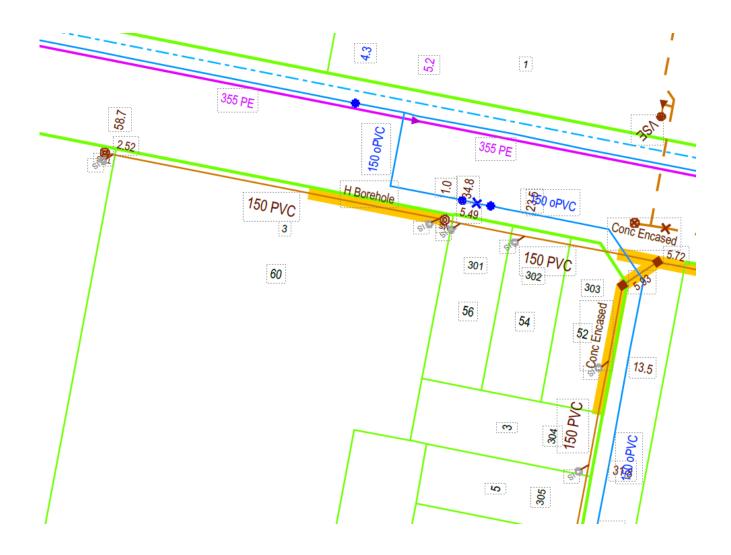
The arrangement of existing Sydney Water, available Sewer, located 400 East of the Site the available sewer access chamber is nominated at a depth of 5.72m below ground level
